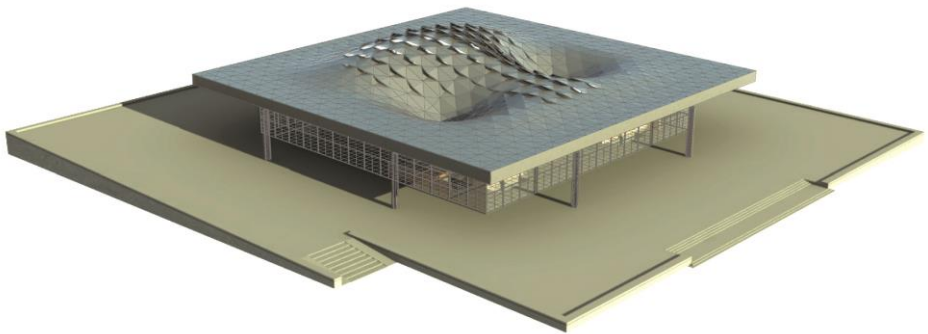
Neue National Gallery Berlin, test case new origami roof design
